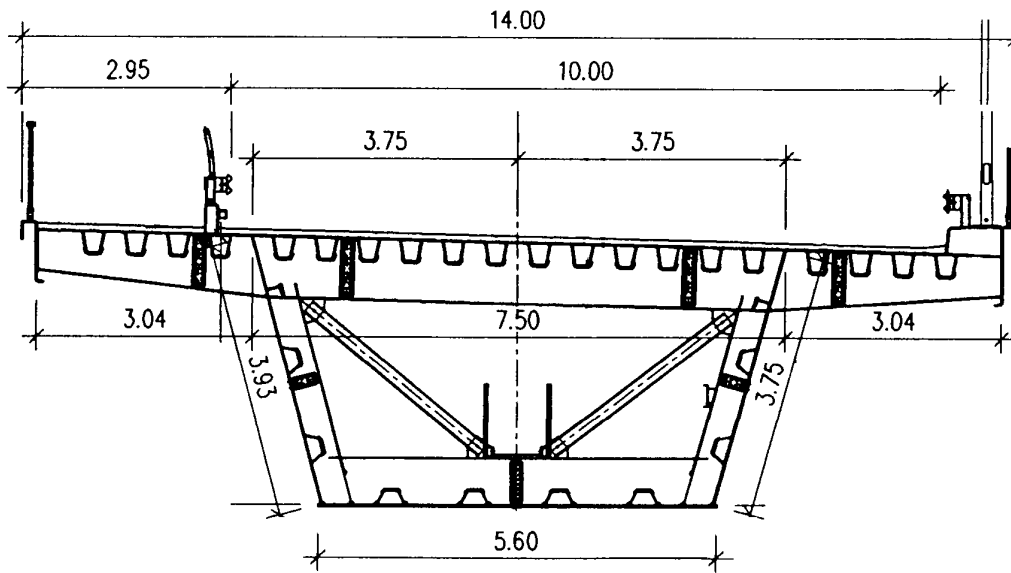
Steel cross section of the steel bridge over the riverbed.
